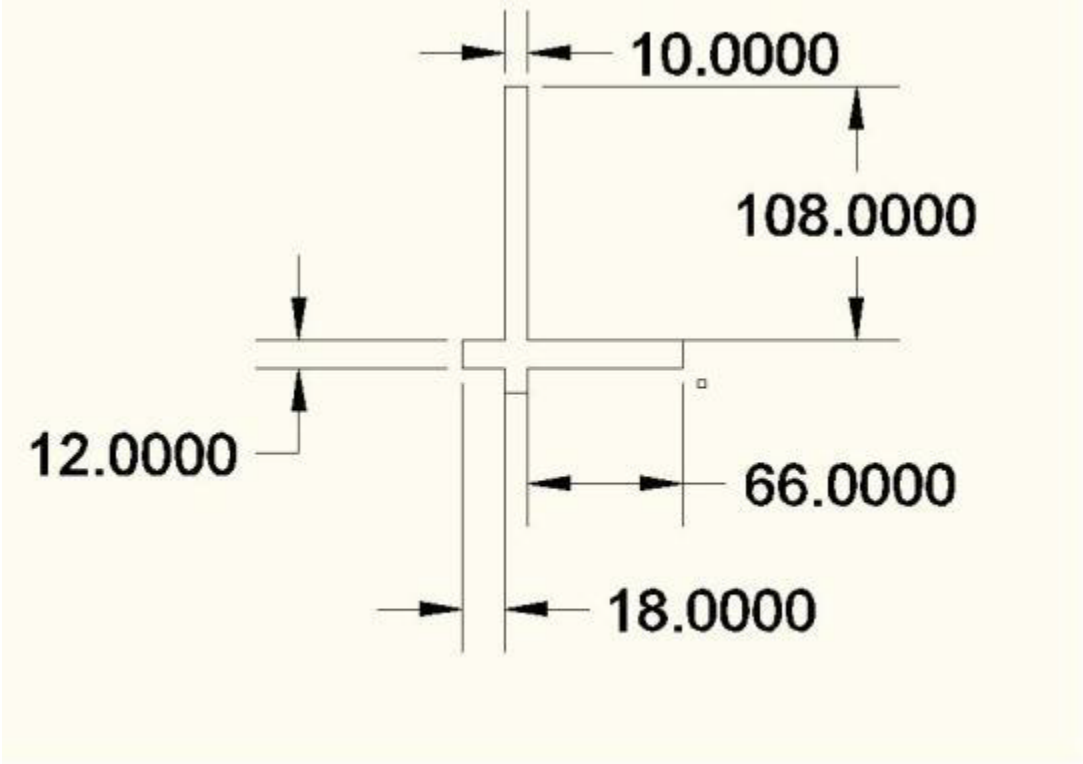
Preliminary Design of Retaining Wall (Cross section, in inches)
